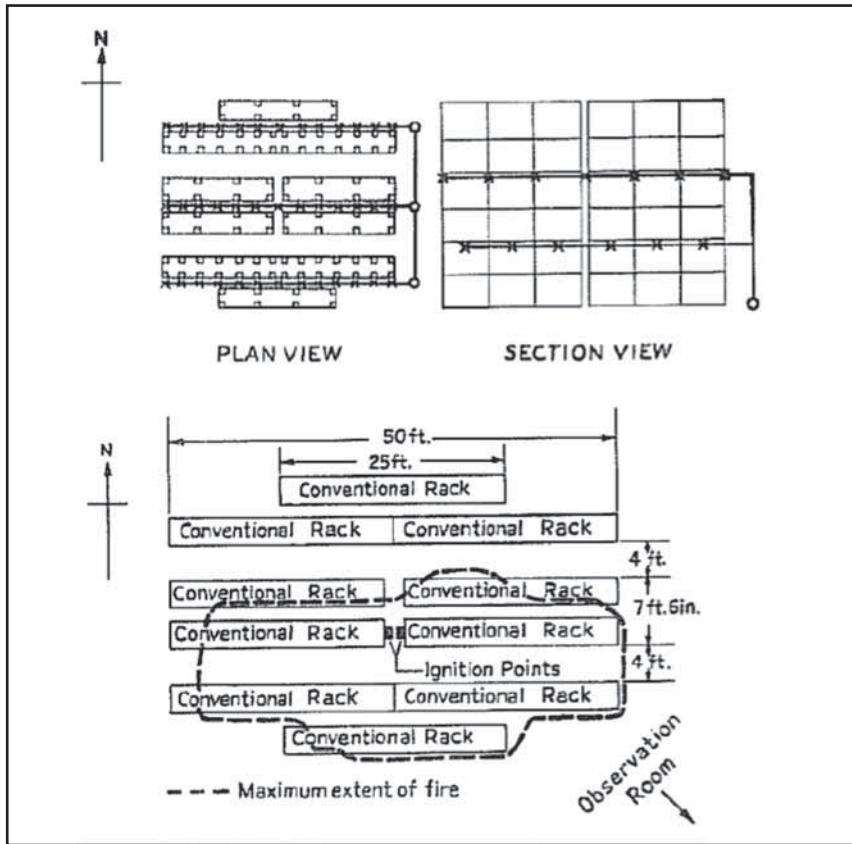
In Rack Sprinkler Arrangement and Fire Test Damage – Wet System Test
